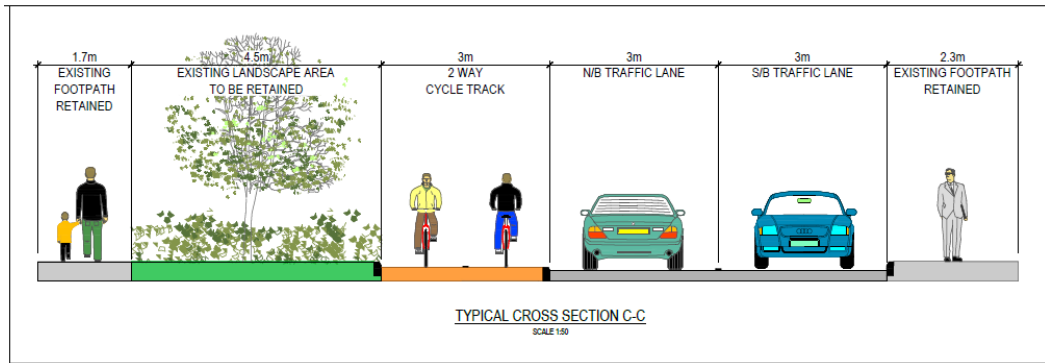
Typical cross section for Deansgrange Road at northern side of scheme
